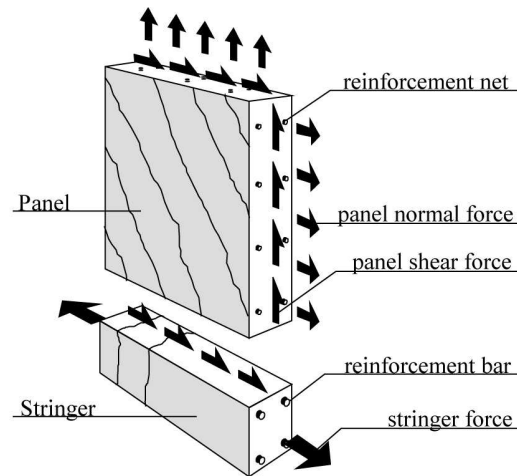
Stringers and panels are building blocks of a structural wall model
